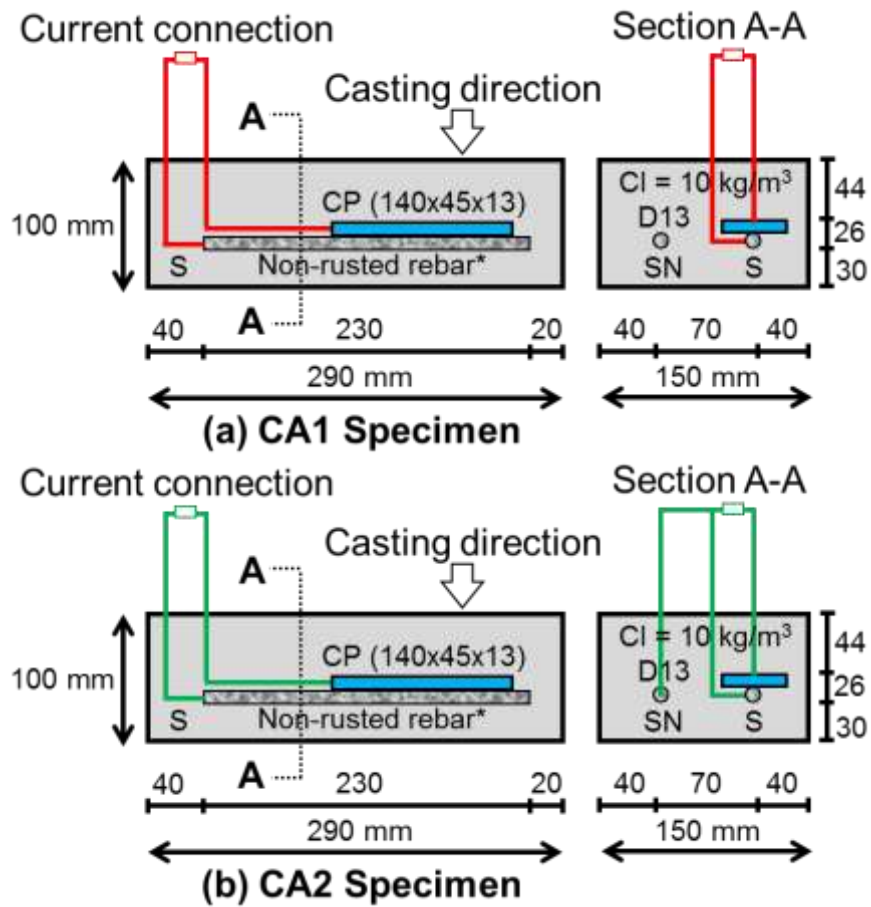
Detailed layout of concrete specimens with acceleration current type A
